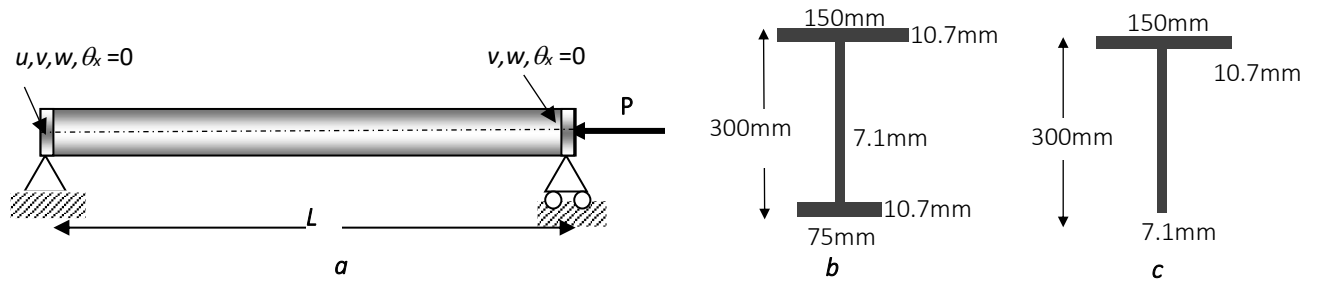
bar with singly symmetric I and Tee cross sections, (a): boundary conditions and load application, (b): singly-symmetric I section dimensions and (c): Tee section dimensions.
